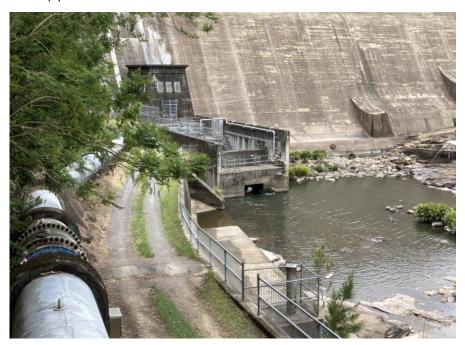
View of the pipeline in relation to the Lower Valve House and Dam Wall
